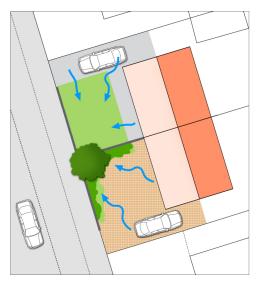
Hardstanding areas should be porous or drain toward a permeable surface, such as a lawn or planted border.
